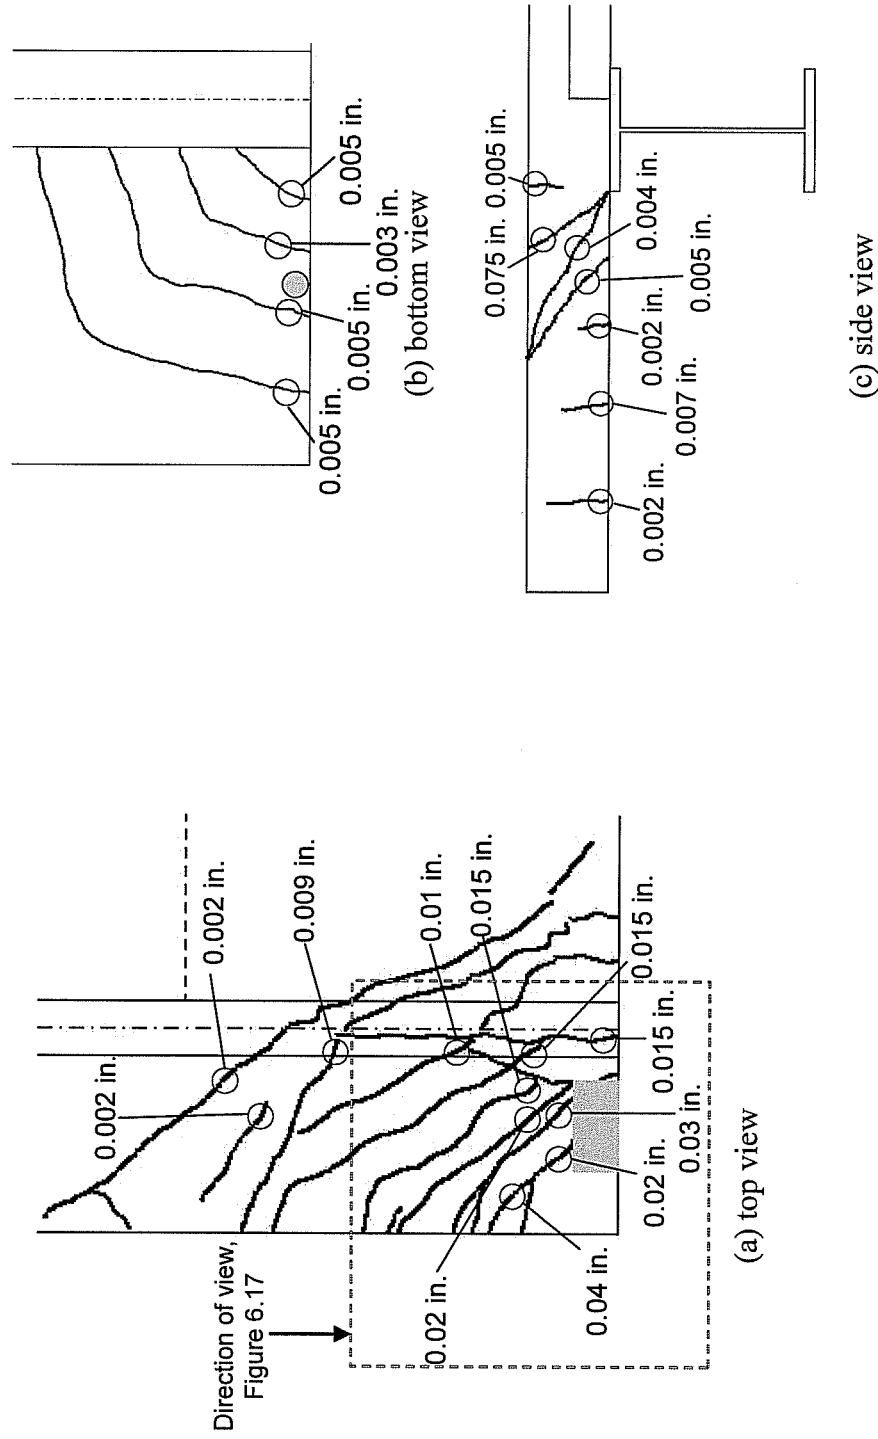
Crack map at failure, Overhang Test Area 2, 6 in. top reinforcement spacing: (a) top view; (b) bottom view; (c) side view, facing north
